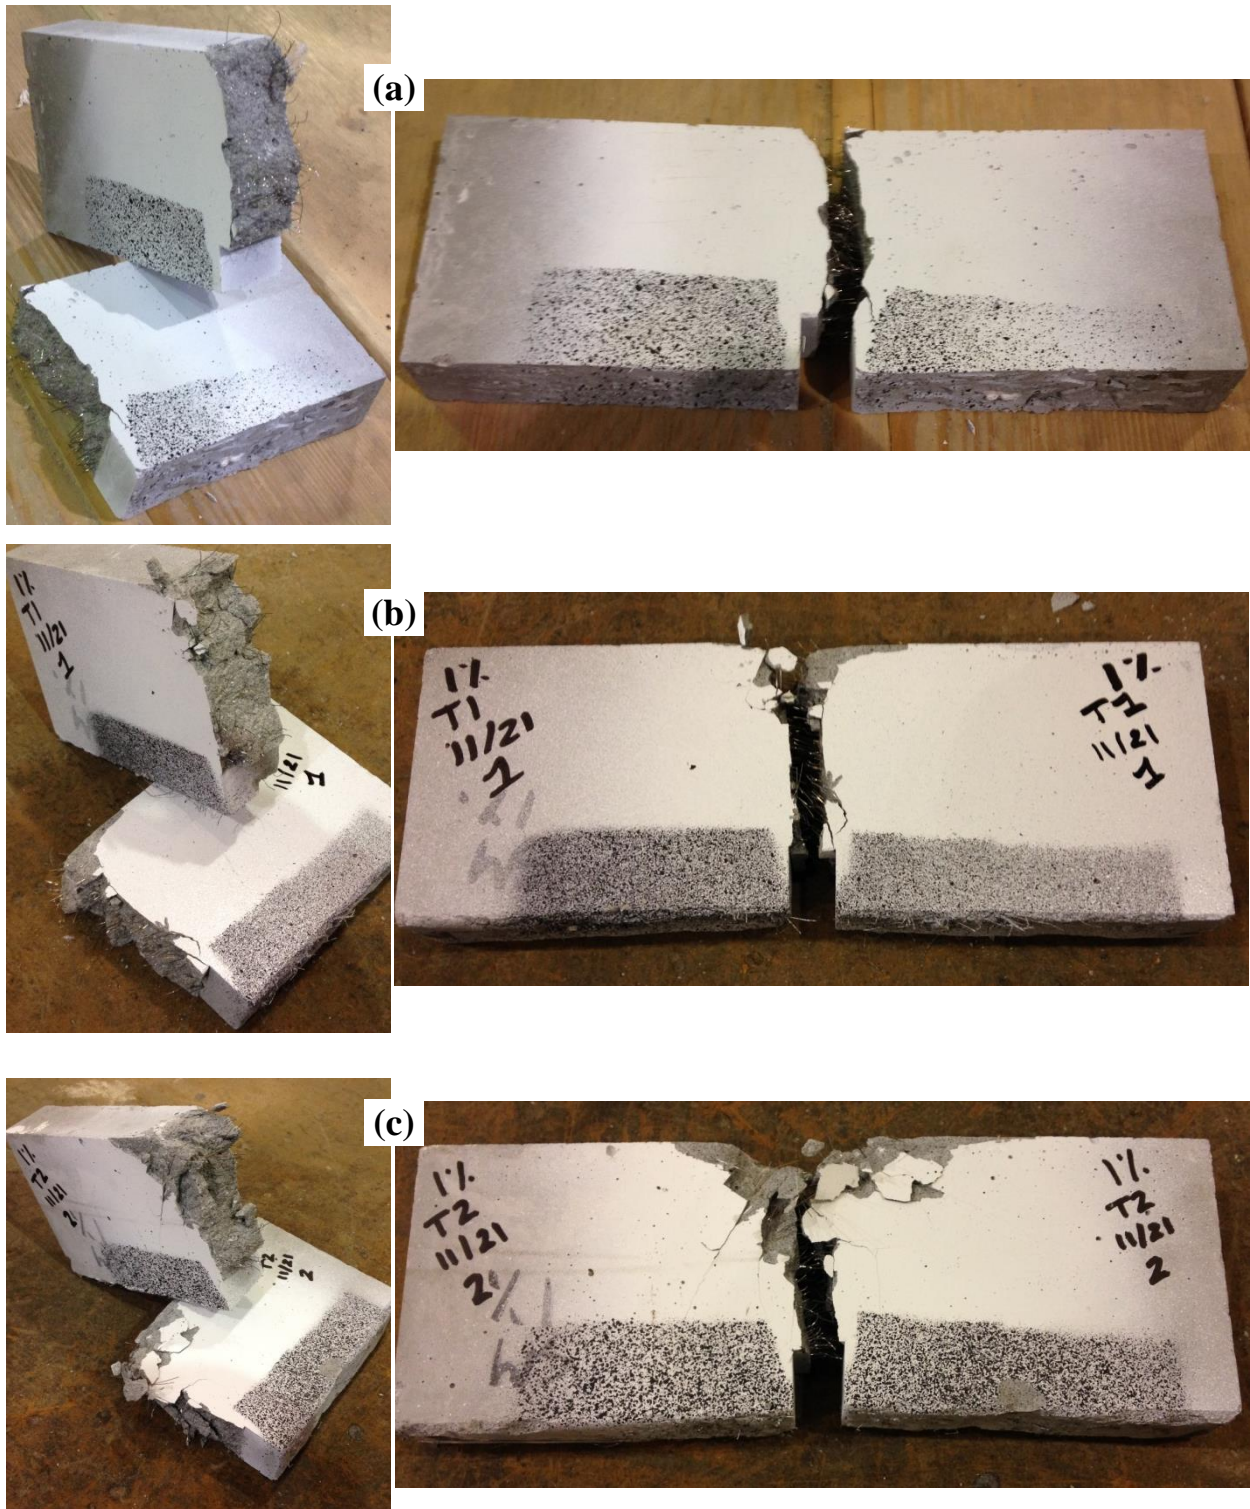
Examples of CS-1.0% specimens after testing: (a) 7.6 mm/sec (using the MTS machine); (b) Type 1 coupler (using M-SEFIM); (c) Type 2 coupler (using M-SEFIM)
